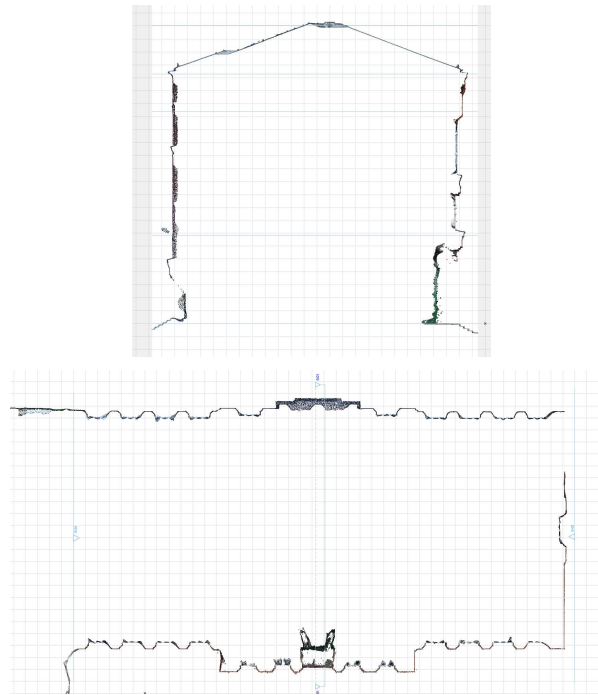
Vertical and horizontal section of a dense point cloud in Archicad
